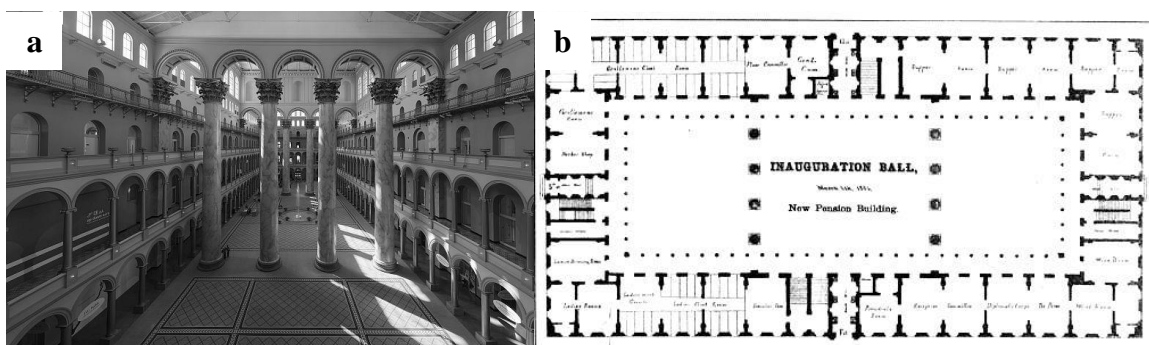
Internal View of the Pension Building's Opening, and the Buildings' Floor Plan
